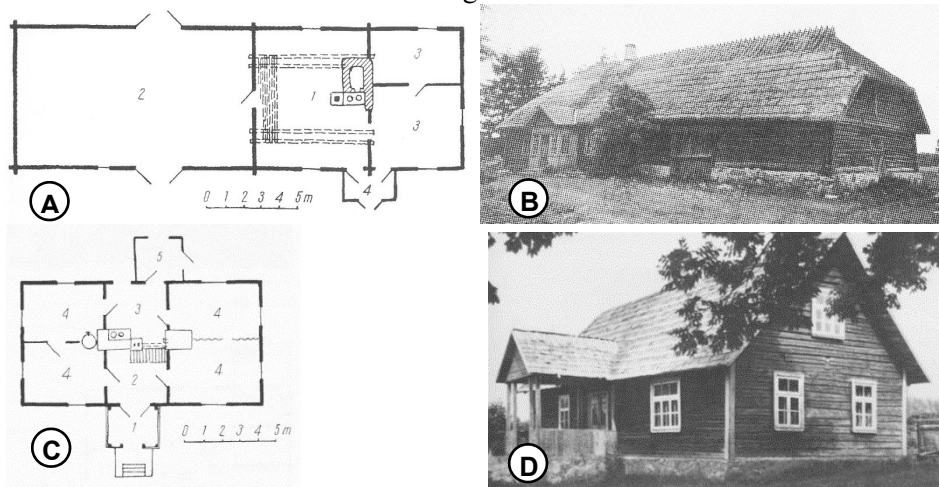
Ground plan of a barn-dwelling built in 1915–1916, Western Estonia: 1 – kiln-room; 2 – threshing-floor; 3 – living rooms; 4 – entrance hall (A). Photo of a barn-dwelling, Northern Estonia (B). View (D) and ground plan (C) of a dwelling, Southern Estonia: 1 – porch; 2 – entrance hall; 3 – kitchen; 4 – living rooms; 5 – veranda (Tihase, 2007).
